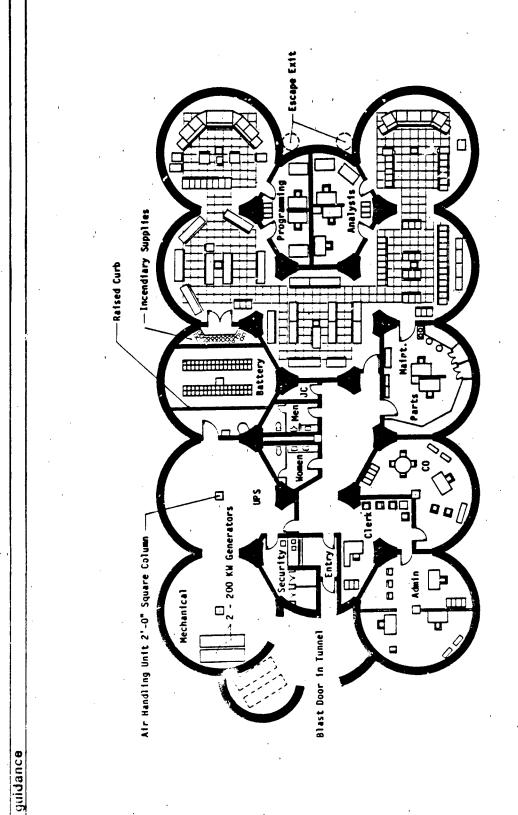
AUTODIN SHITCH FACILITY PLAN -- DONE CONFIGURATION.
